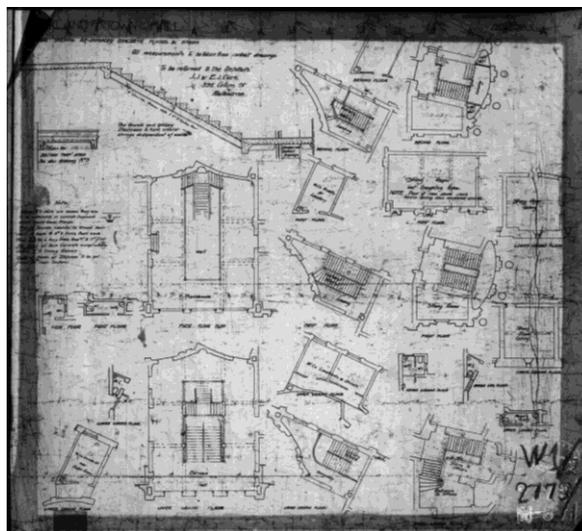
Auckland Town Hall: Drawing Showing Reinforced Concrete Floors and Stairs. Detail No. 9 (Auckland Council Archives, AKC 033 City Engineers Works Plans Aperture Cards 1782-1993, Record No. 2773-1).
